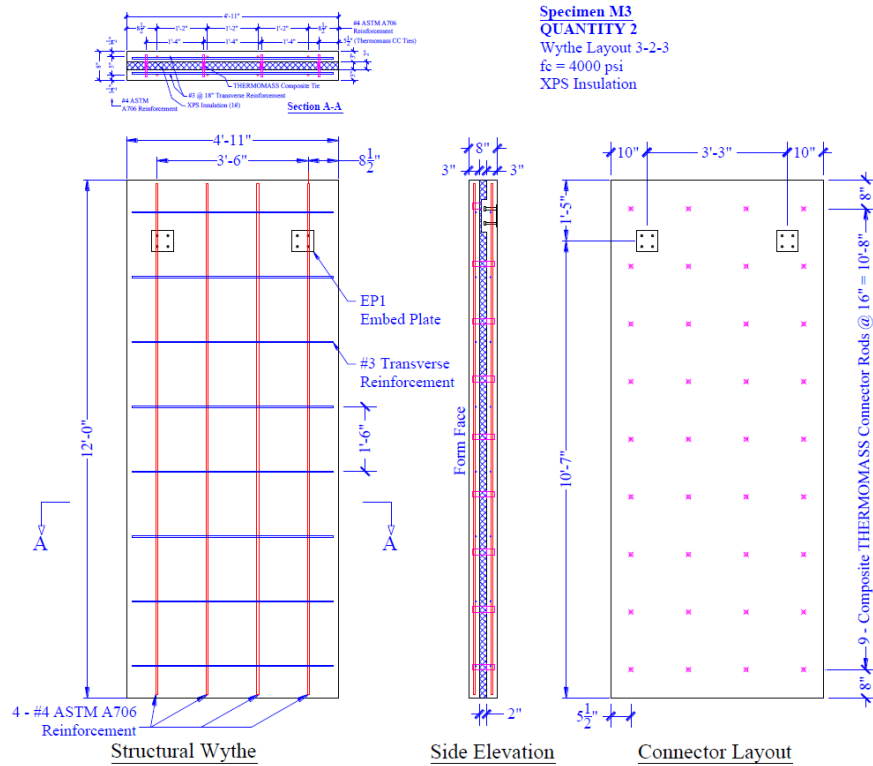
Specimen M3 Details (Naito et al. 2011)
